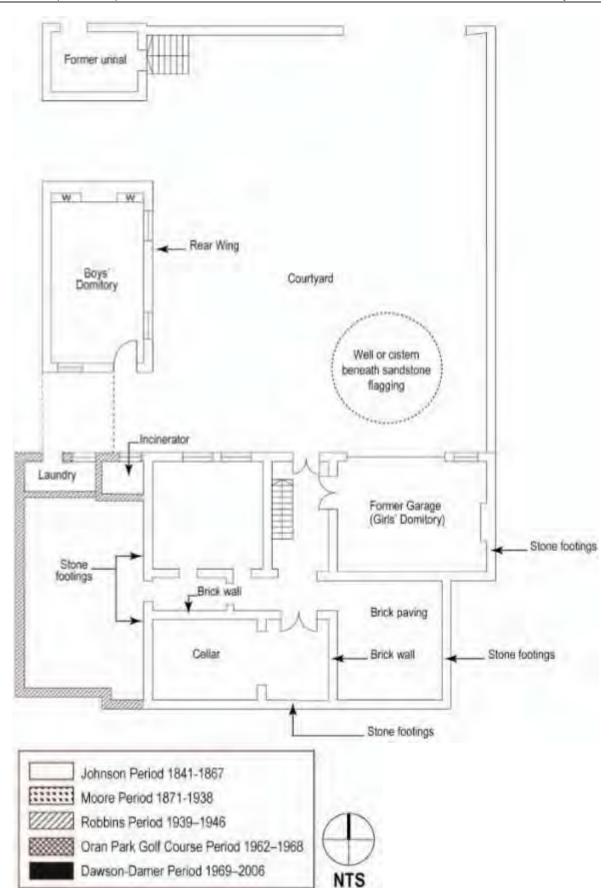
Basement Sketch Plan not to scale. Source: GML 2010 CMP pg. 60.
